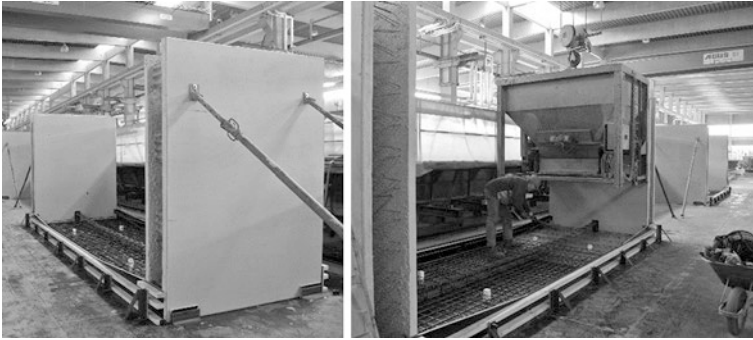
Hollow wall elements are placed upright and the reinforcement cage for the floor slab is installed *left*. Casting of the floor slab *right
